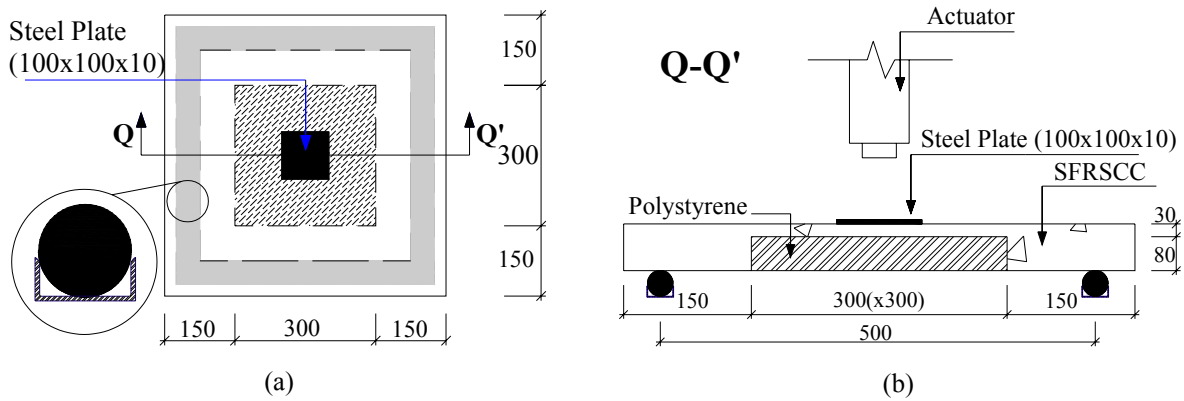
(a) Test panel prototype for the punching resistance and (b) test setup (dimensions in mm).
